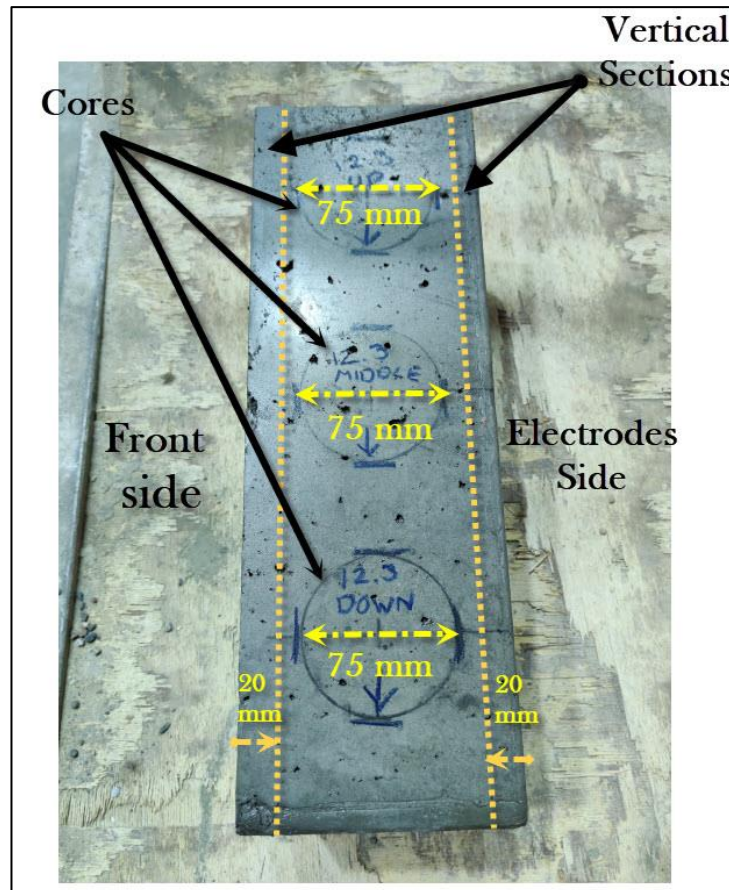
Dimensions and layout of the drilled cores and the vertical cut sections on a hardened concrete sample.
